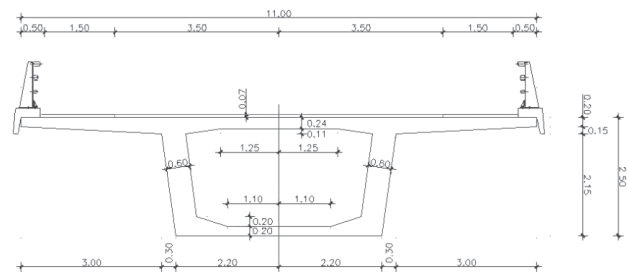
Río Cabriel Bridge - Cross-section at mid span
